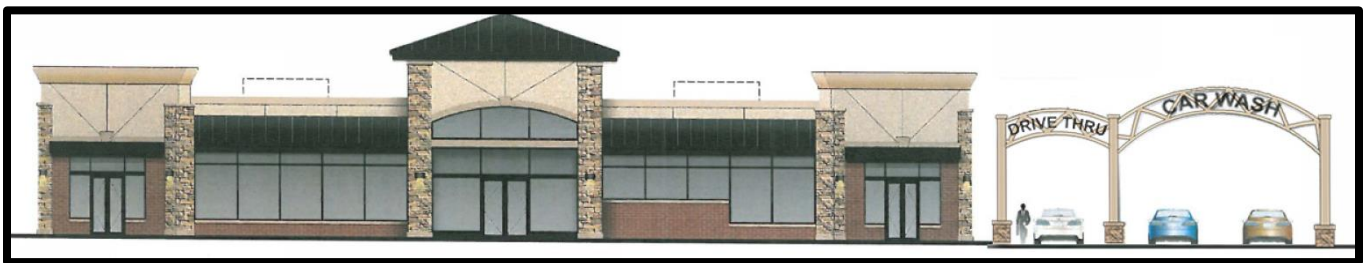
C-Store/fast food building elevation with associated architectural arch element
